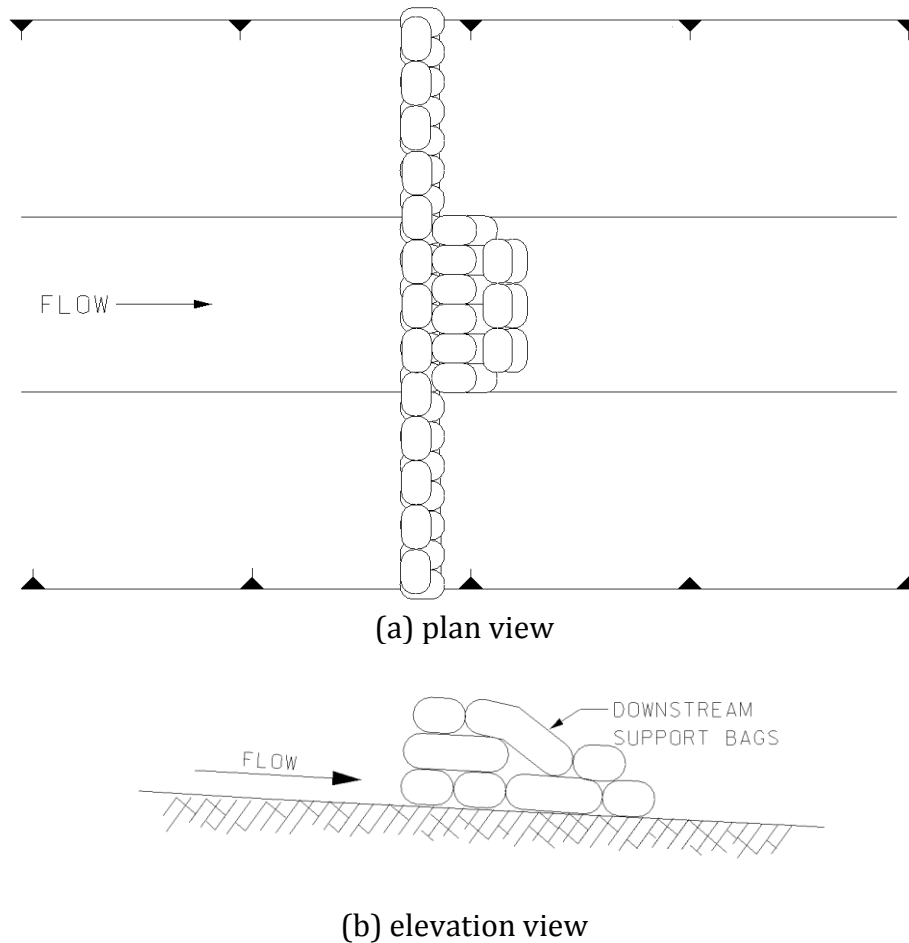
Sand Bag Installation Modifications CADD Drawing.
